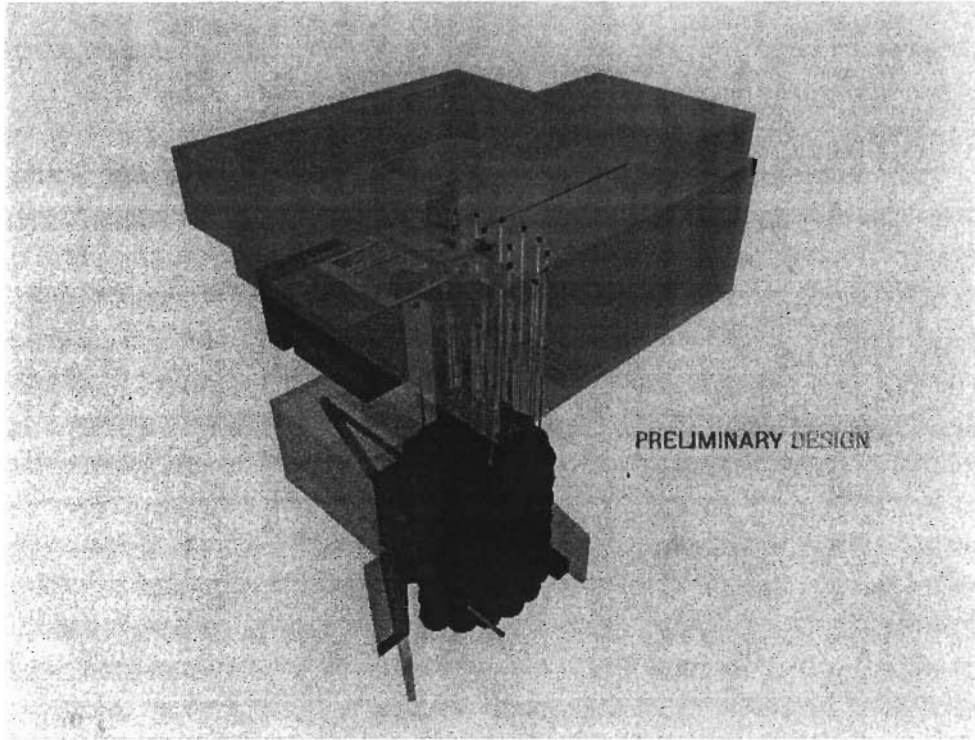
Activated Soil Zone Superimposed on Cross-Section View of the BLIP Building
